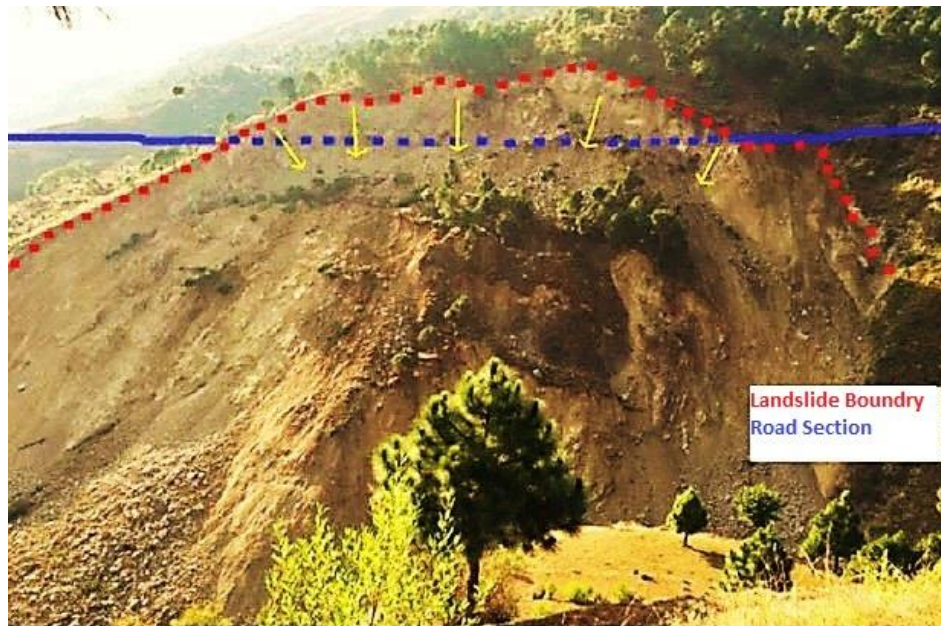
Failure surface of Havelian Landslide, the collapsed section of the road is shown [5]
